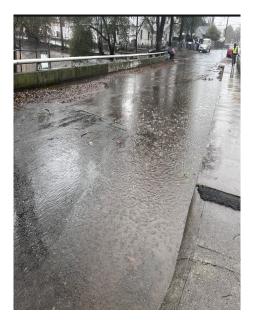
ARCADE CREEK LOOKING WEST FROM VERANO BRIDGE
